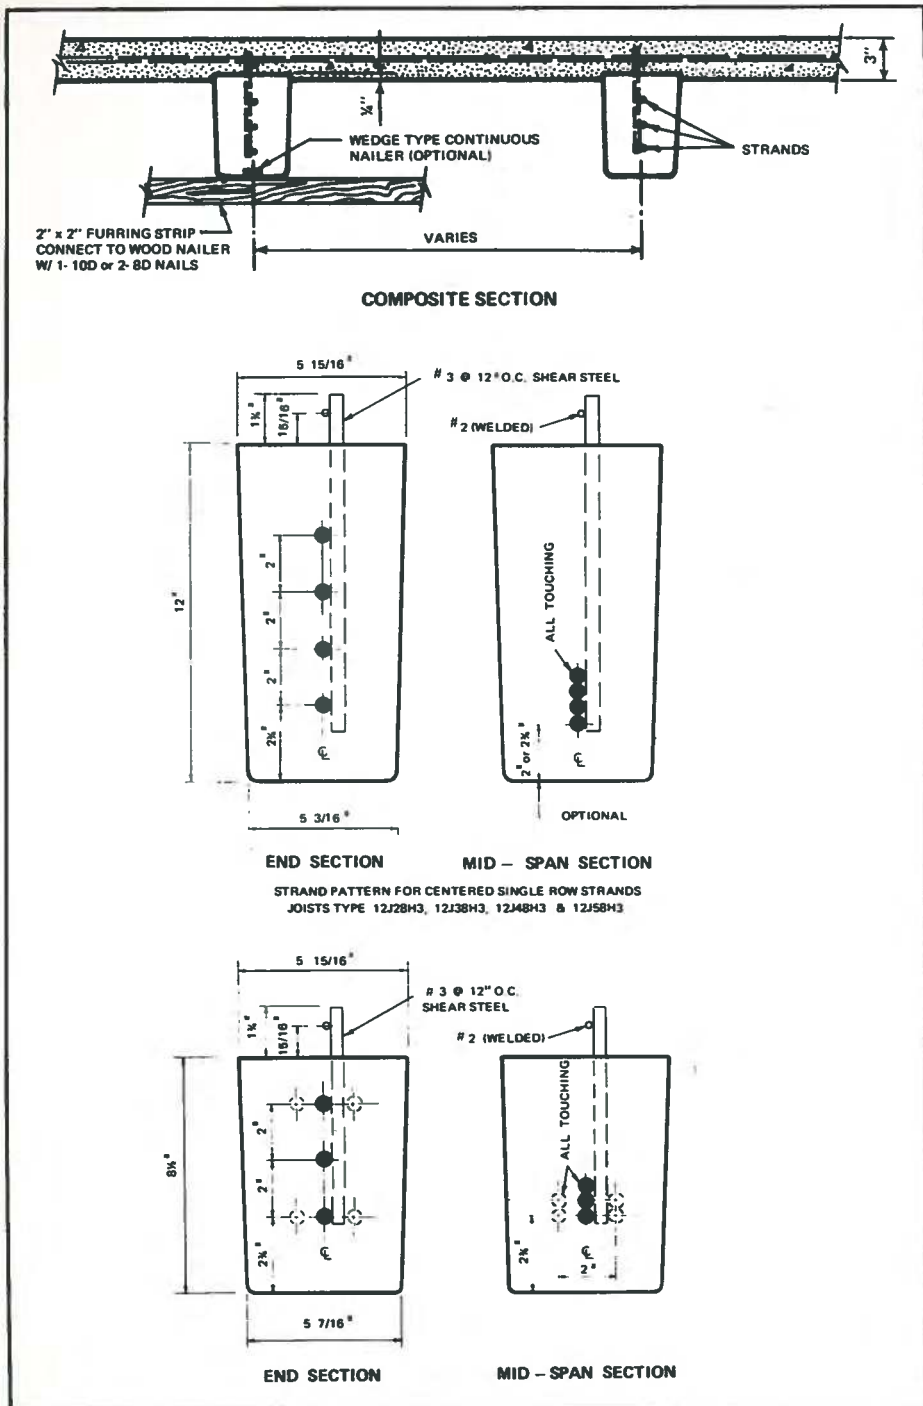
The keystone joist with a composite cast-in-place deck became in the sixties a leading floor system in Florida. The system was developed by Prestressed Systems, Inc., of Miami, Florida.
